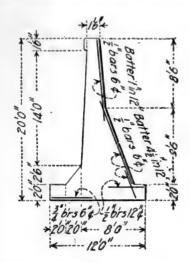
RETAINING WALL, C. B. & Q. R. R.
